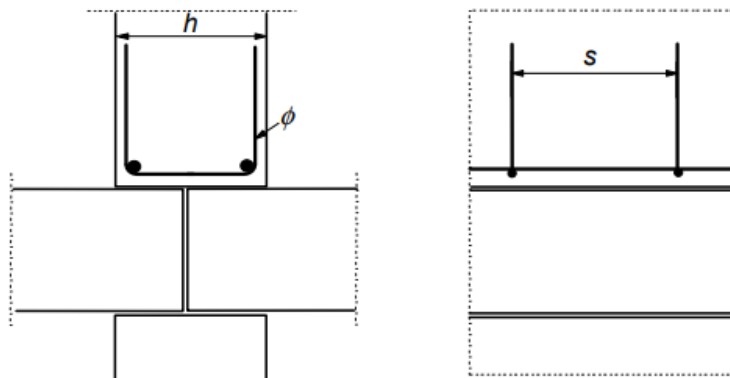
Example of required reinforcement in a wall above two floor slabs when the applied load exceeds the limit of $0.5 \cdot h \cdot f_{cd}$ (NEN-EN 1992-1-1+C2, Section 10.9.2; Nederlands Normalisatie-instituut (NEN), 2011)
